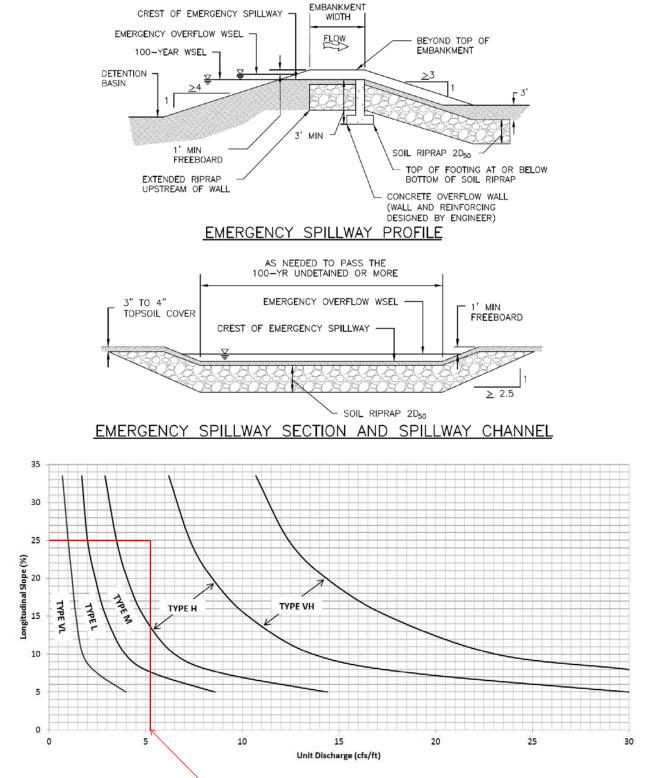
Embankment protection details and rock sizing chart (adapted from Arapahoe County) 181 cfs/35 ft = 5.17
